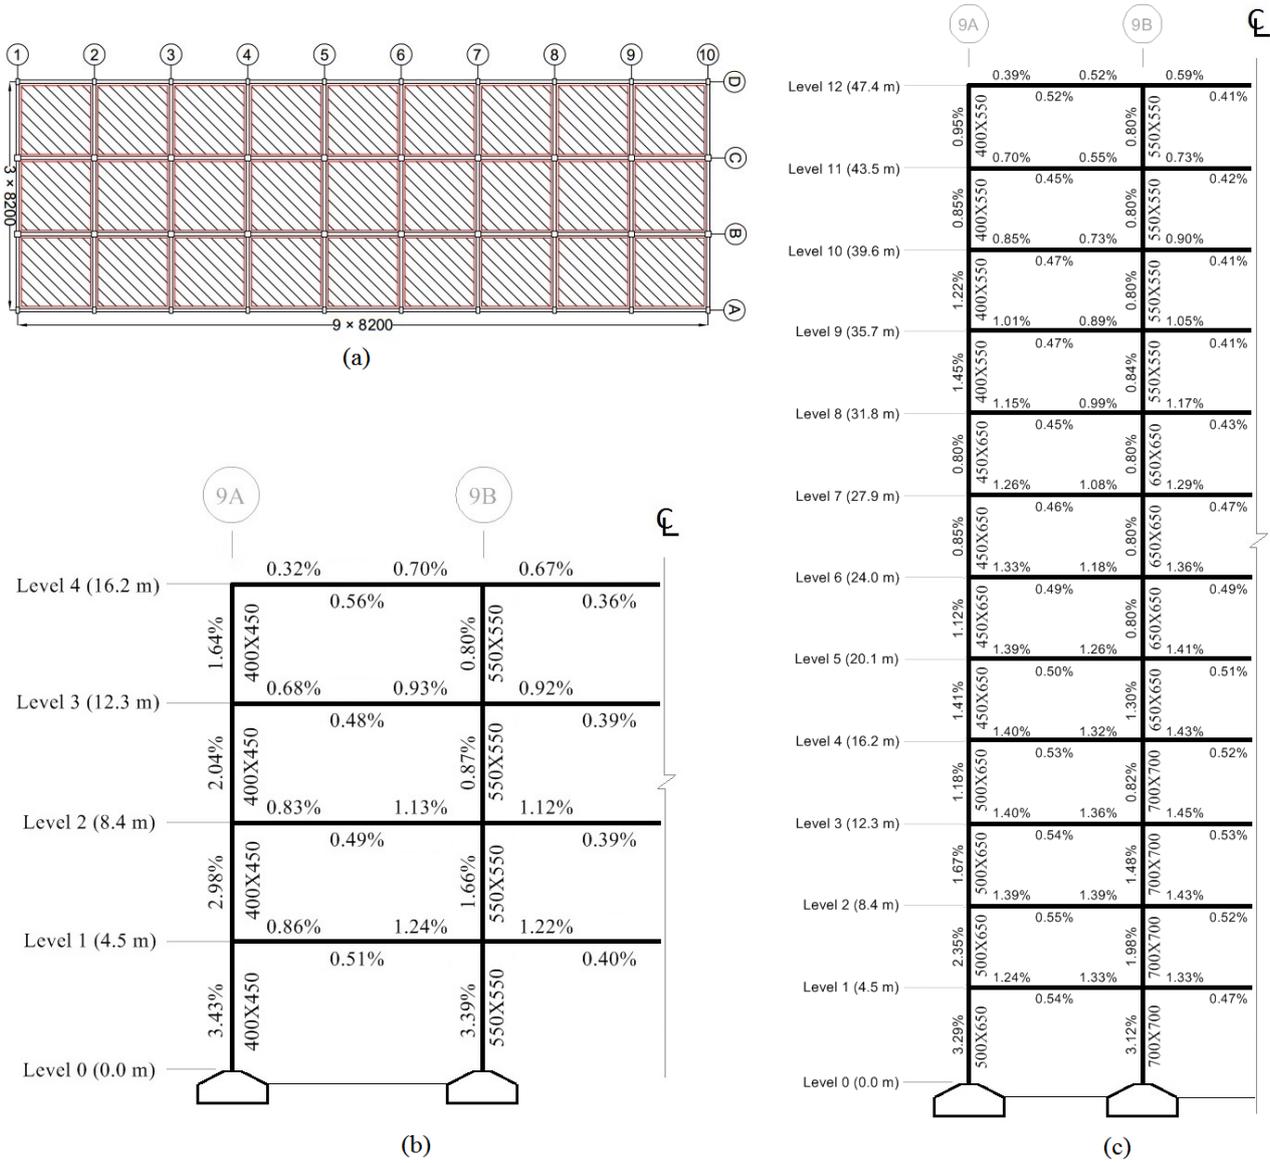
(a) Plan and section details of (b) 4-story building (ID-2221) and (c) 12-story building (ID-2225). All beams of both buildings are 400x750 mm in size.
